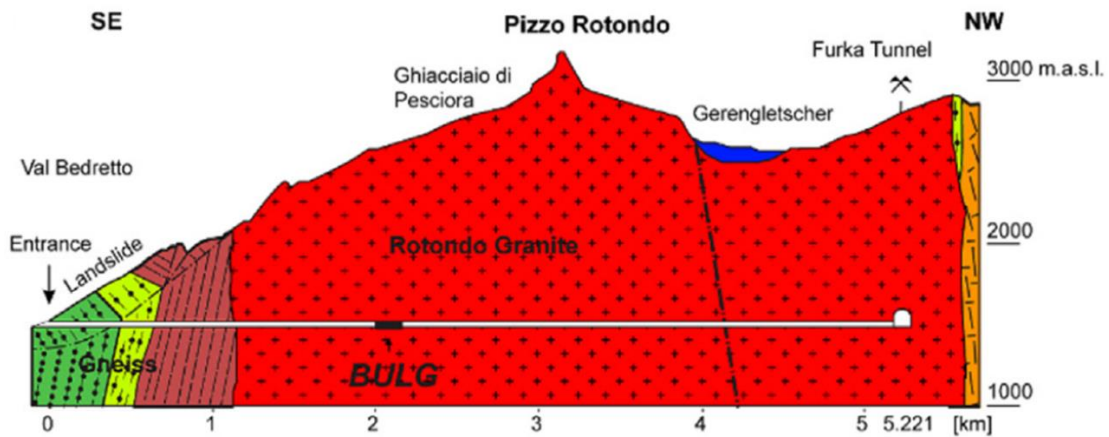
A simplified geological cross-section of the Bedretto adit (Gischig et al., 2020)
